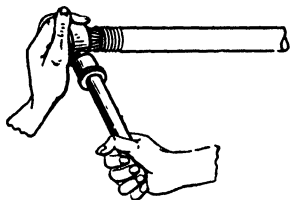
Ream pipe ends after cutting to remove burrs. (Courtesy of Crane Co.)
